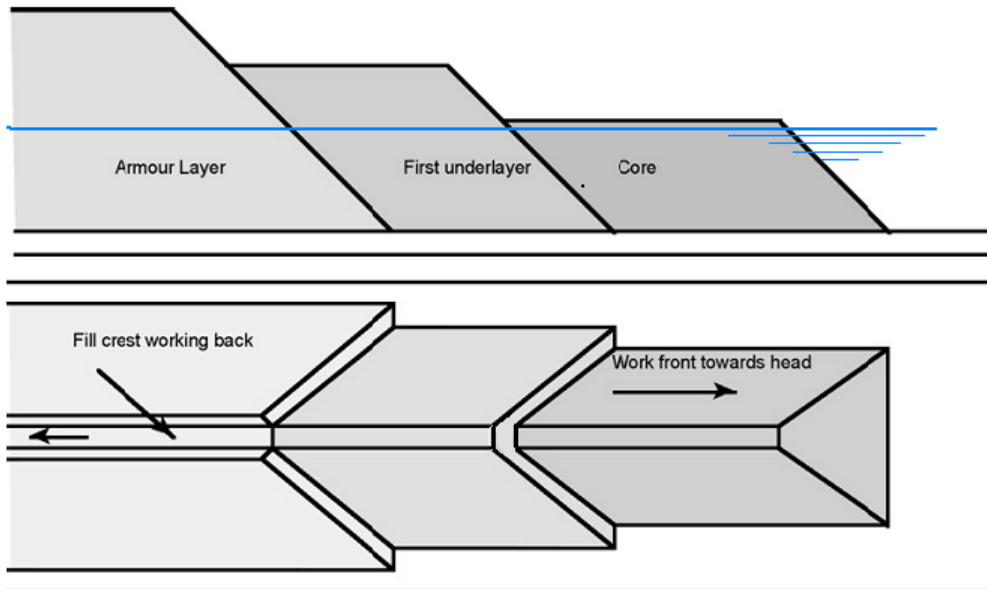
The serial construction process of the dam in the longitudinal direction. First the core has to be placed, when after the under layers and final armour layer can be positioned (source: Van den Bos, 2017b)
